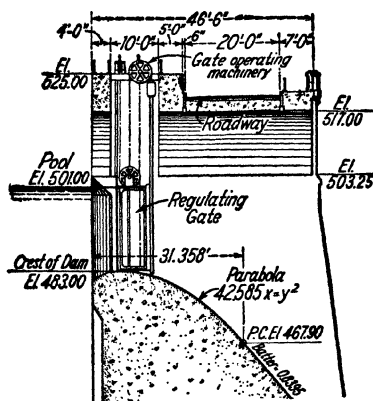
Stoney Crest Gate Installation at Wilson Dam, Alabama.
